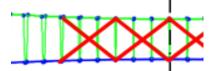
Vertical Bracing Pattern at Center of 50 m Span Footbridge
